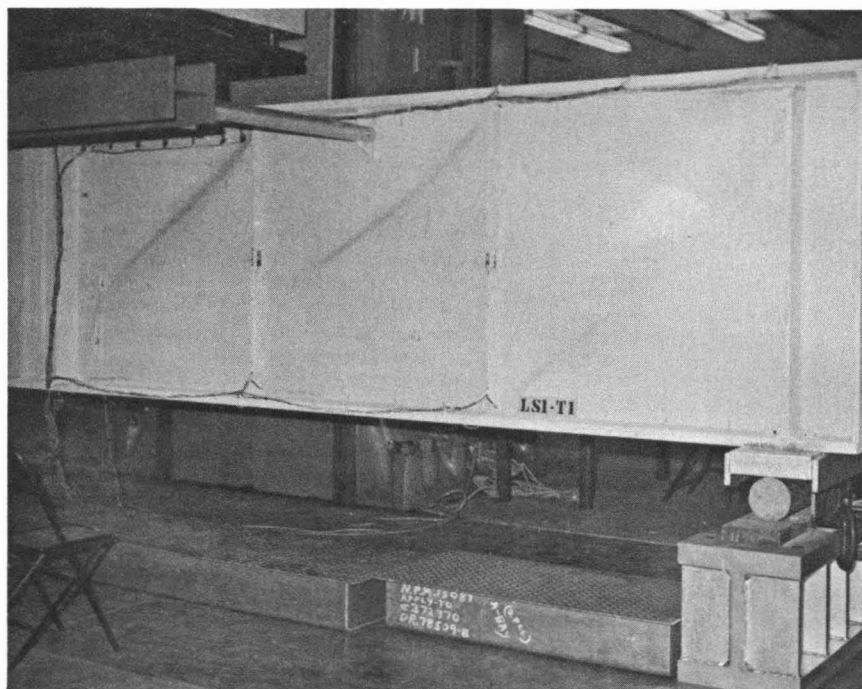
Yield Patterns in Girder LSI at Load No. 14
